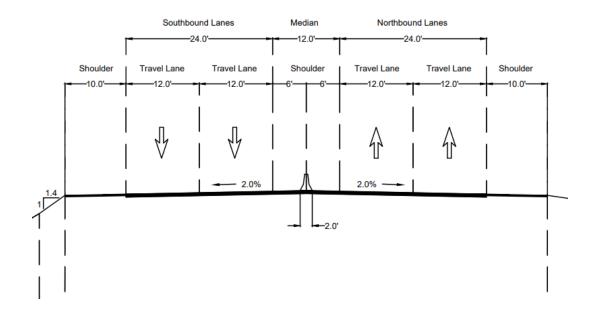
Typical cross section of existing lane configuration on Highway 17.
